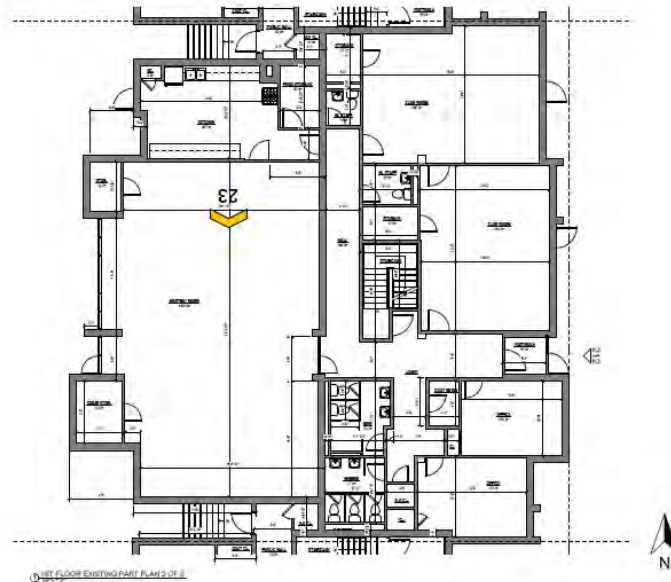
Block 2 - 212 Stuyvesant Avenue Photo Key Plan, First Floor
